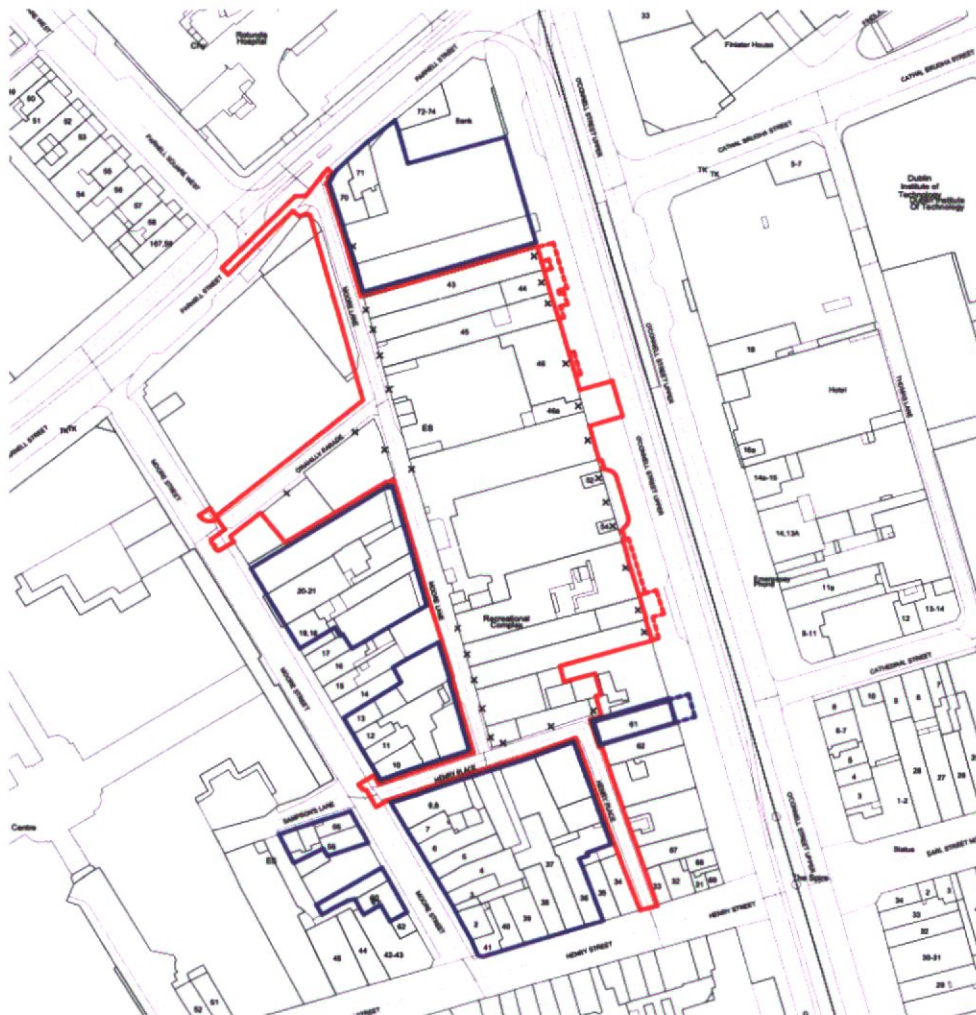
Proposed Dublin Central Masterplan, with Site 2 outlined in RED and No.61 denoted
